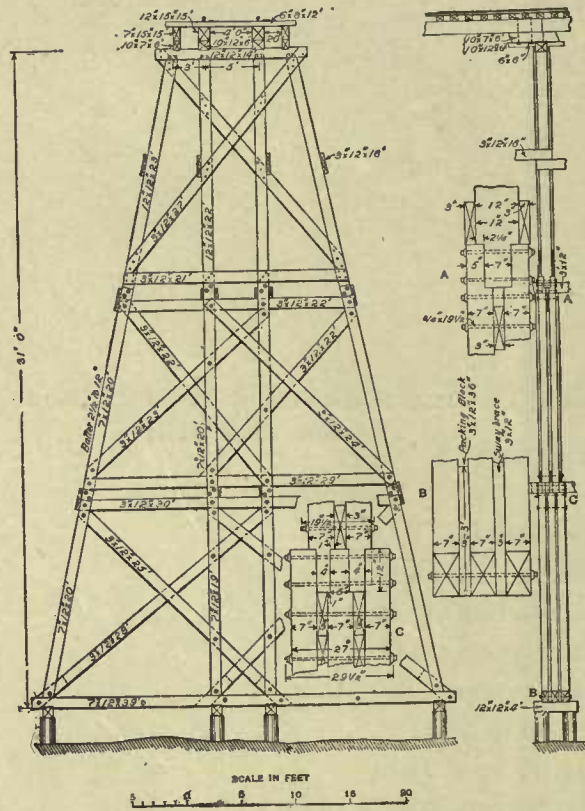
DOUBLE AND TRIPLE DECK FRAMED TRESTLE.
